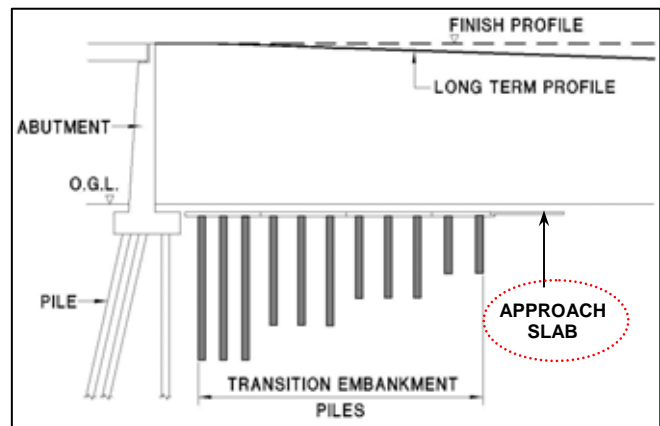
Transition Embankment Piles (After Gue, 2000)
